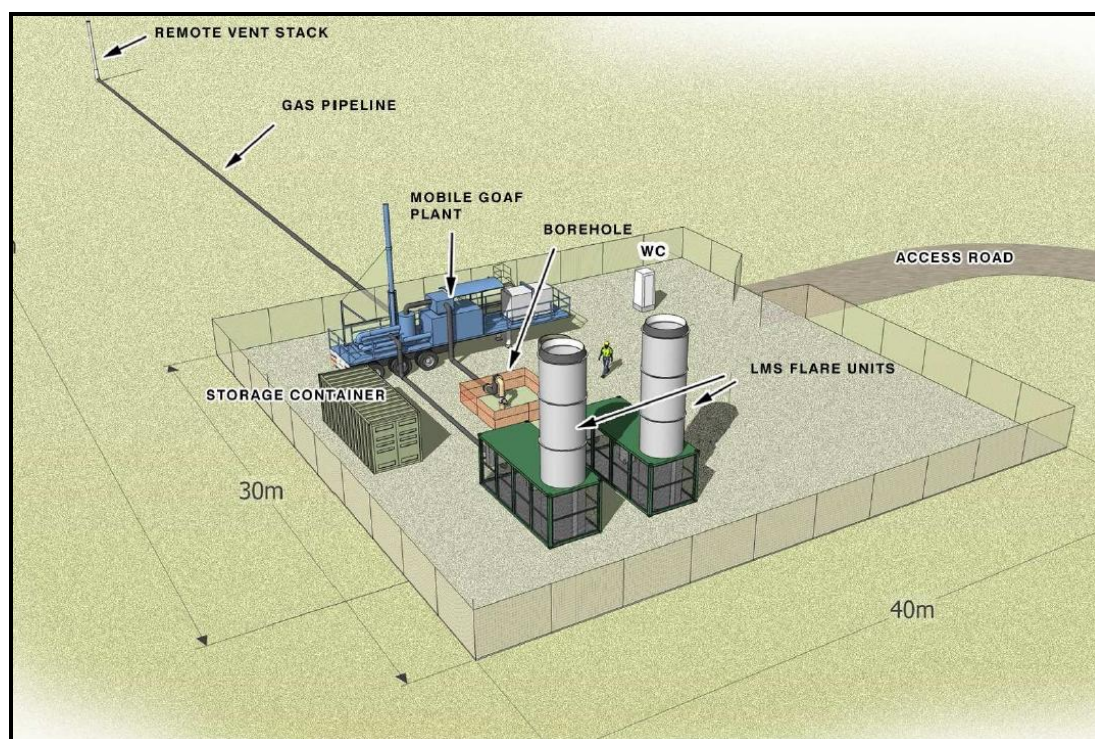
Typical Extraction Plant Layout (Source: Maurice Hayler & Associates Architects)
